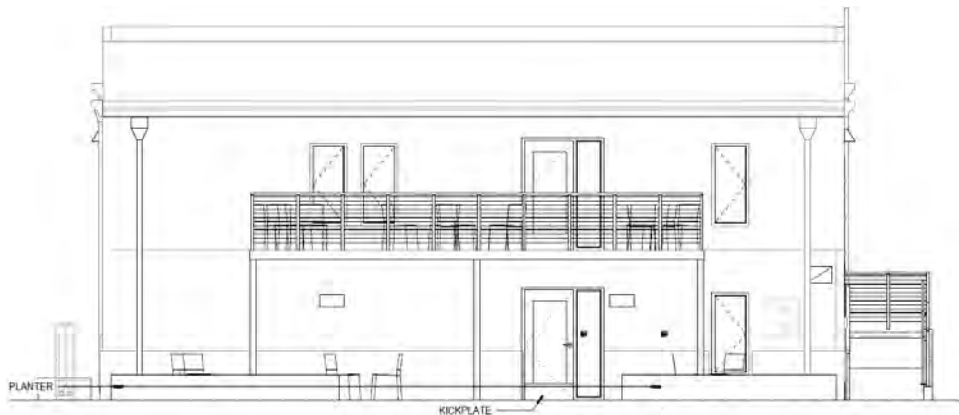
North (rear) elevation. Plans courtesy of ORW Architecture. November 2022.
